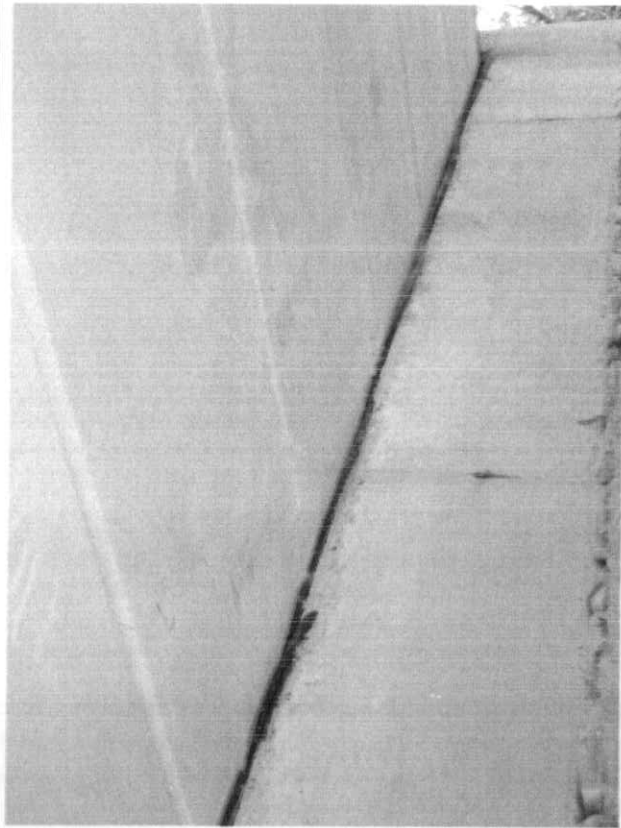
Bearing material between deck units and the north abutment cap squeezing out
